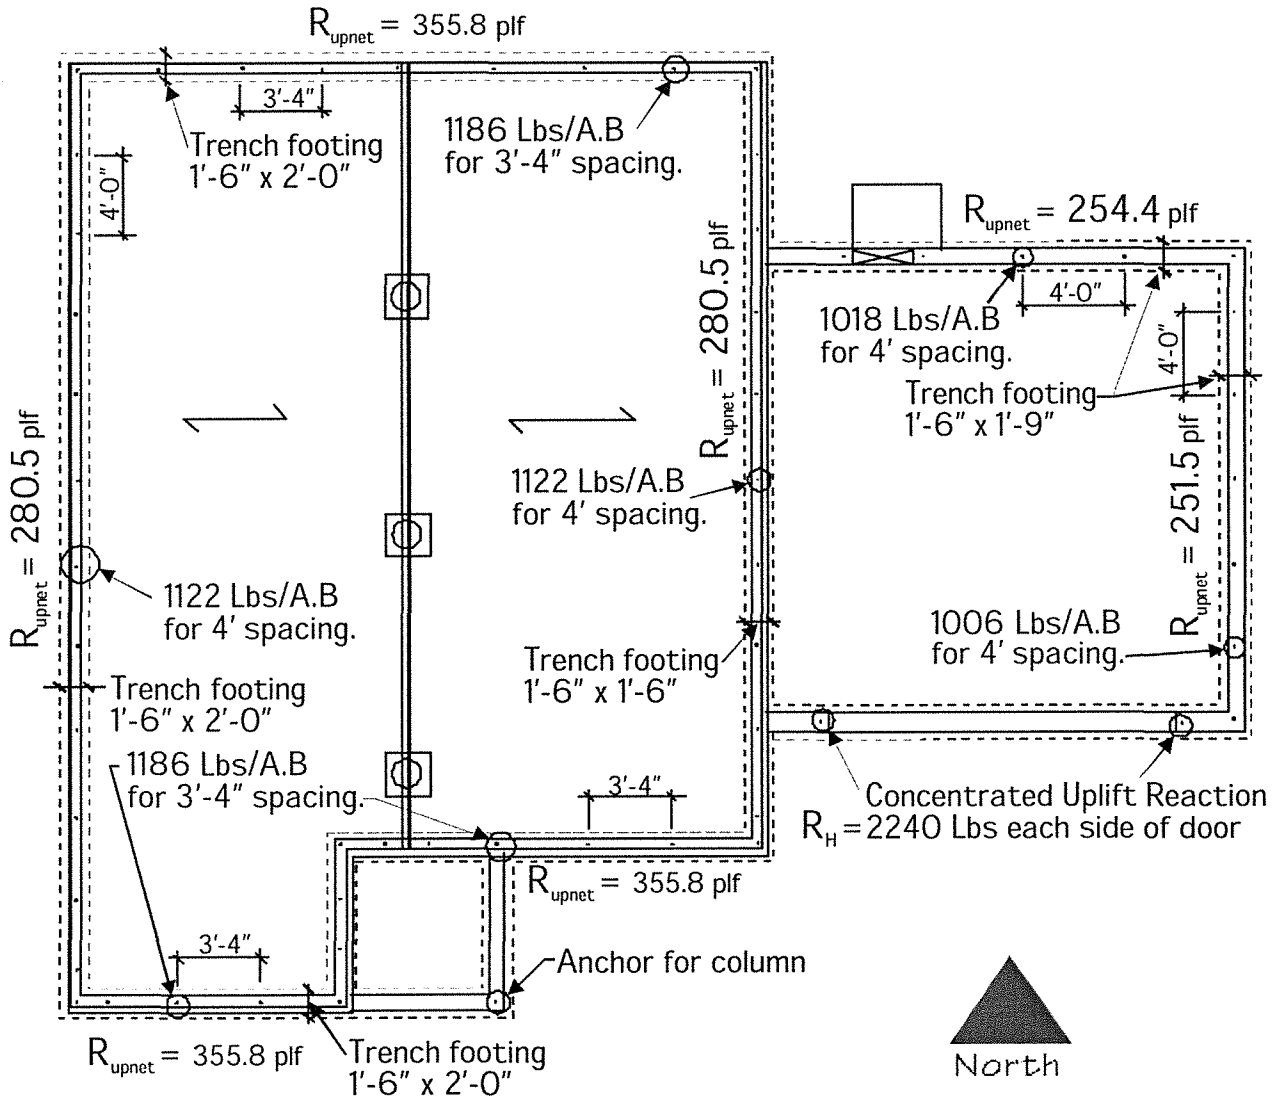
Summary of Net Uplift Forces at Foundation, A. B. Spacing & Minimum Trench Footing Sizes
